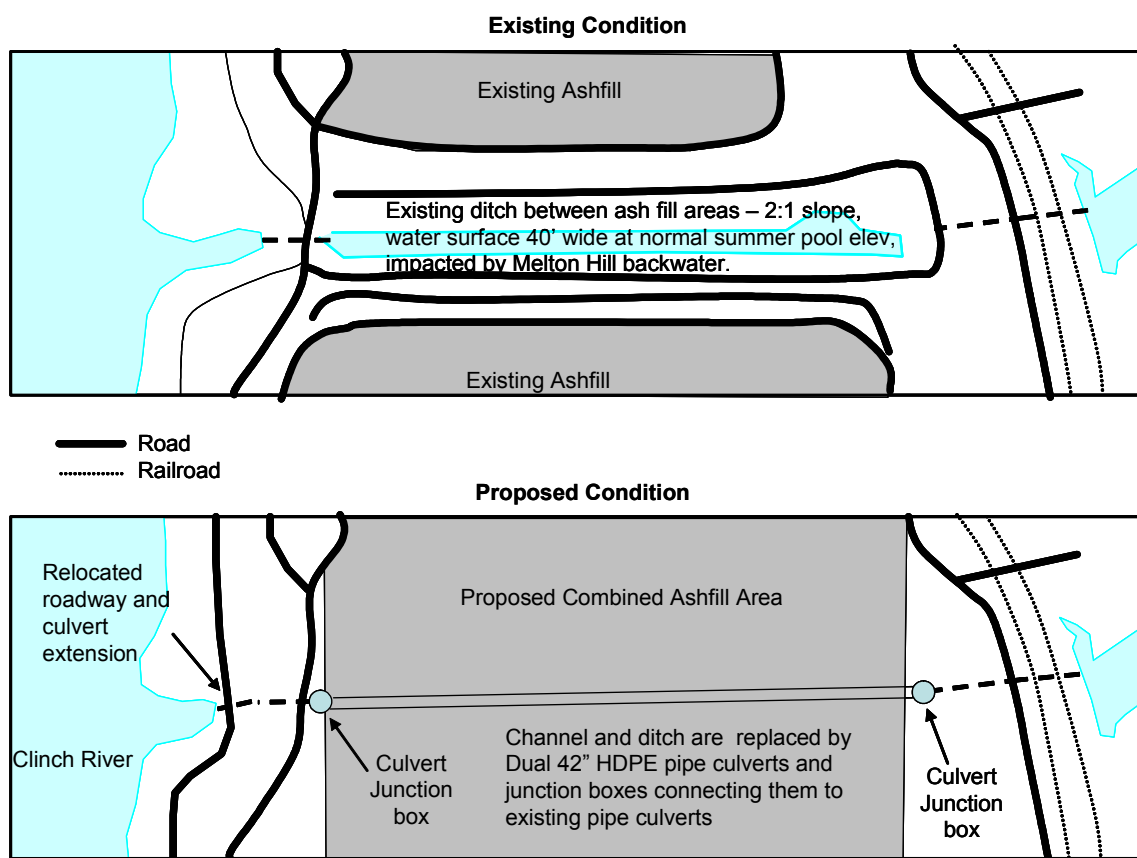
Existing and Proposed Ash Fill Areas and Creek Impacts for Area 1A
